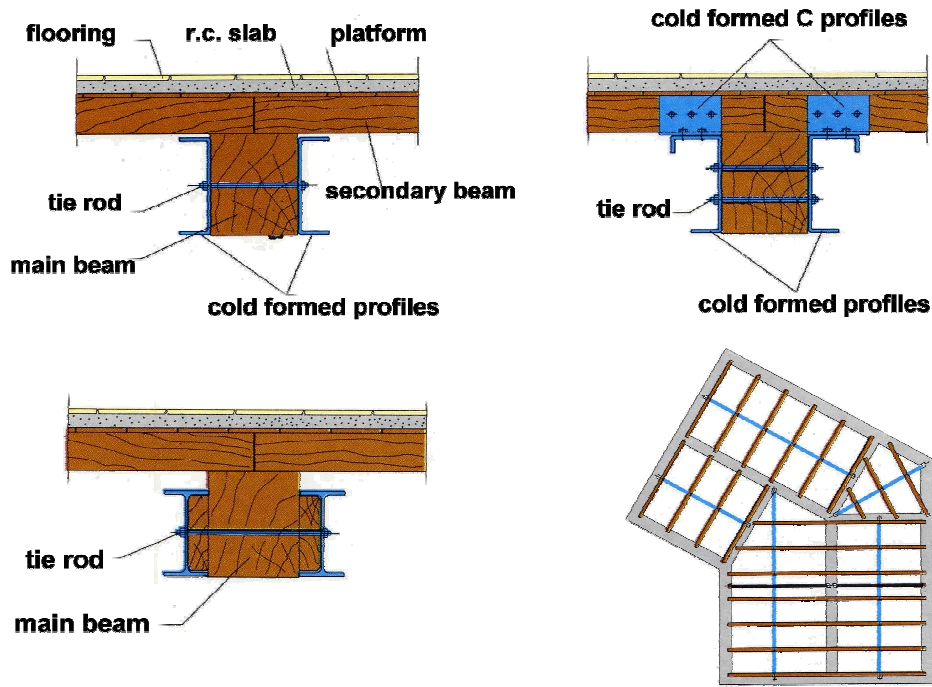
Repairing a wooden floor from the bottom upwards (Mazzolani) [159]
